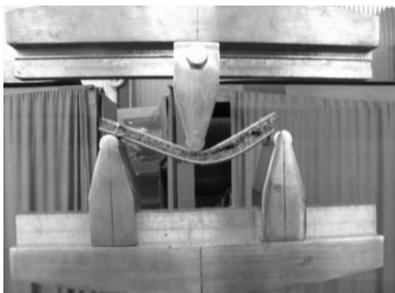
Failure mode of a sandwich beam loaded in three-point bending
